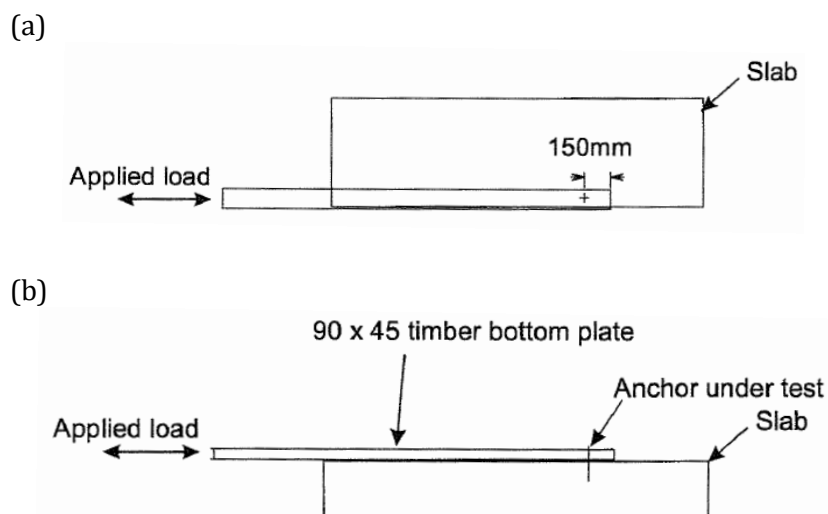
Schematic in plane shear test setup as per BRANZ Study Report No. 125, (a) plan view, (b) side view
